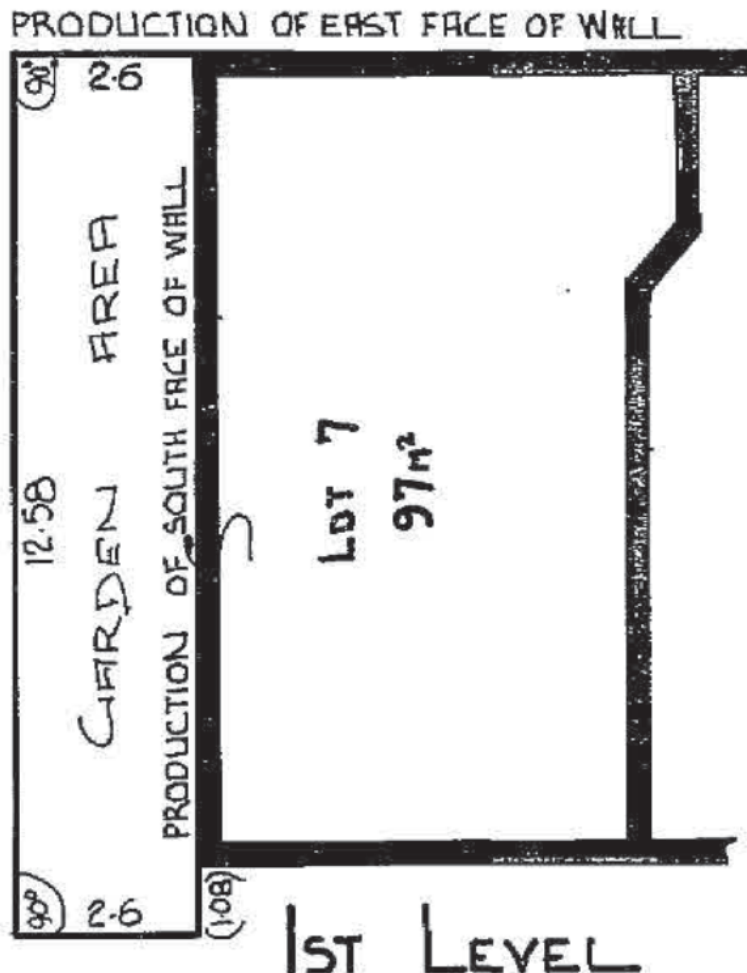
Extract from Strata Plan 12958 showing Lot 7 and garden area forming part of Lot 7
